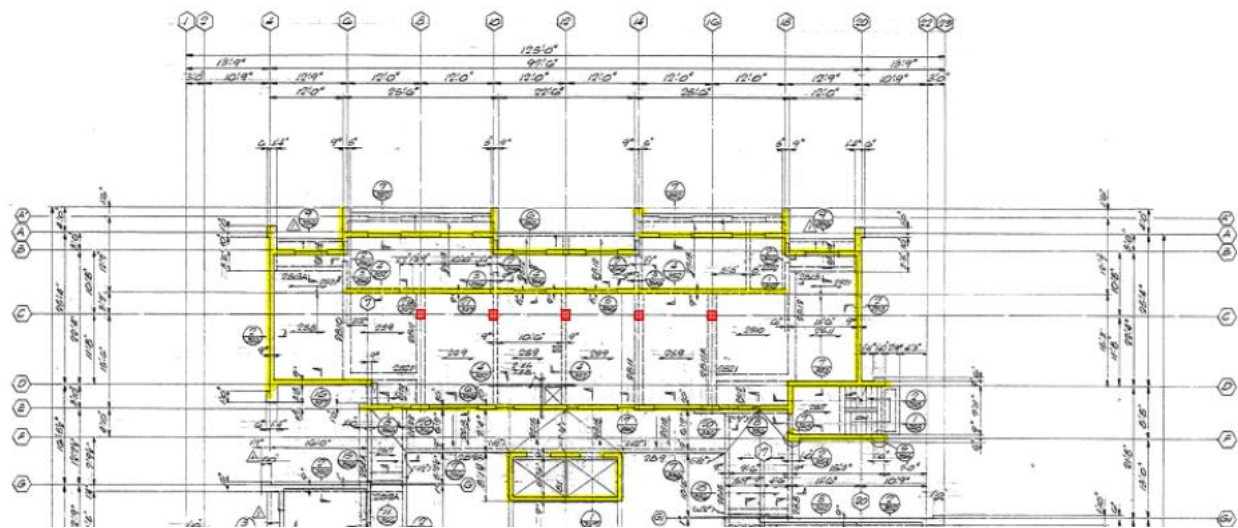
Perimeter concrete bearing walls and interior concrete column lines (excerpt from the original construction documents). The red squares are the columns while the yellow shaded areas are the shear walls.
